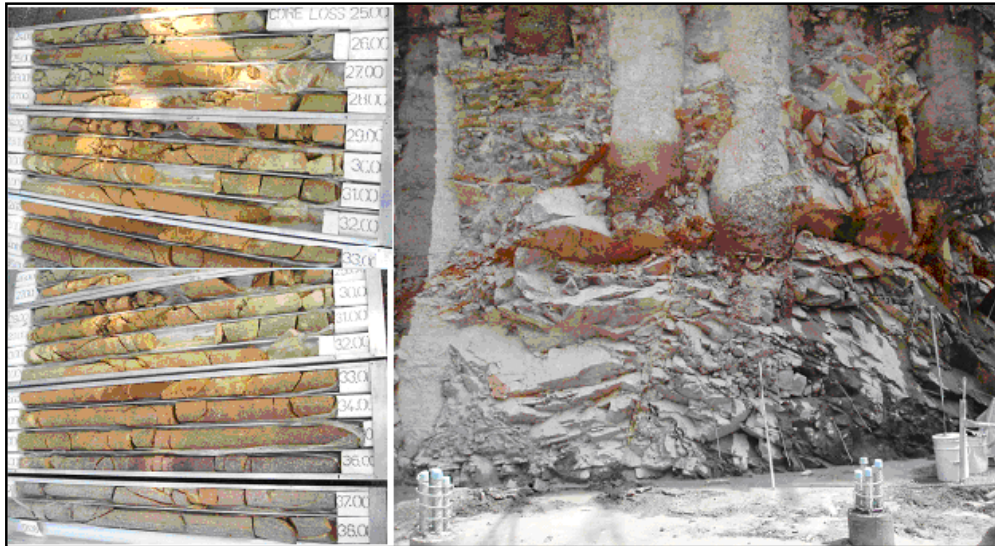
Typical coring log and exposed excavation into Jurong Siltstone/Sandstone
